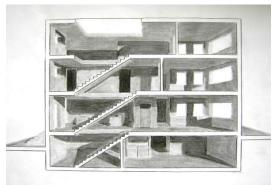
Cross section of a typical 3.5 storey (half basement) rowhouse in Philadelphia
